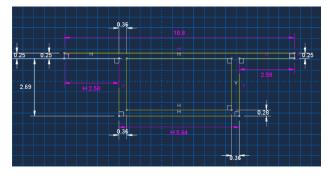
Cross-section of Han-Jiang Bridge (dimension in m).
